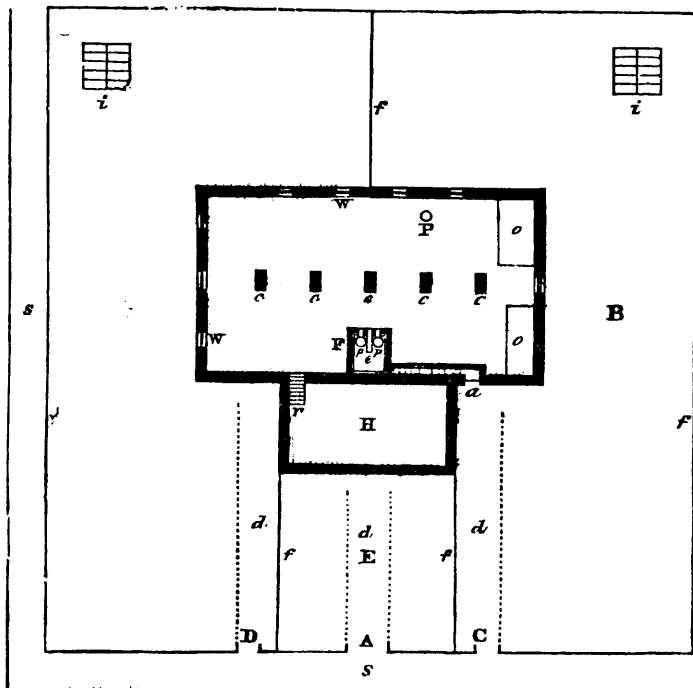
FIG. II.—BLOCK PLAN OF GROUNDS, ETC., OF PLAN NO. 2 FOR A GRAMMAR OR UNION SCHOOL.
